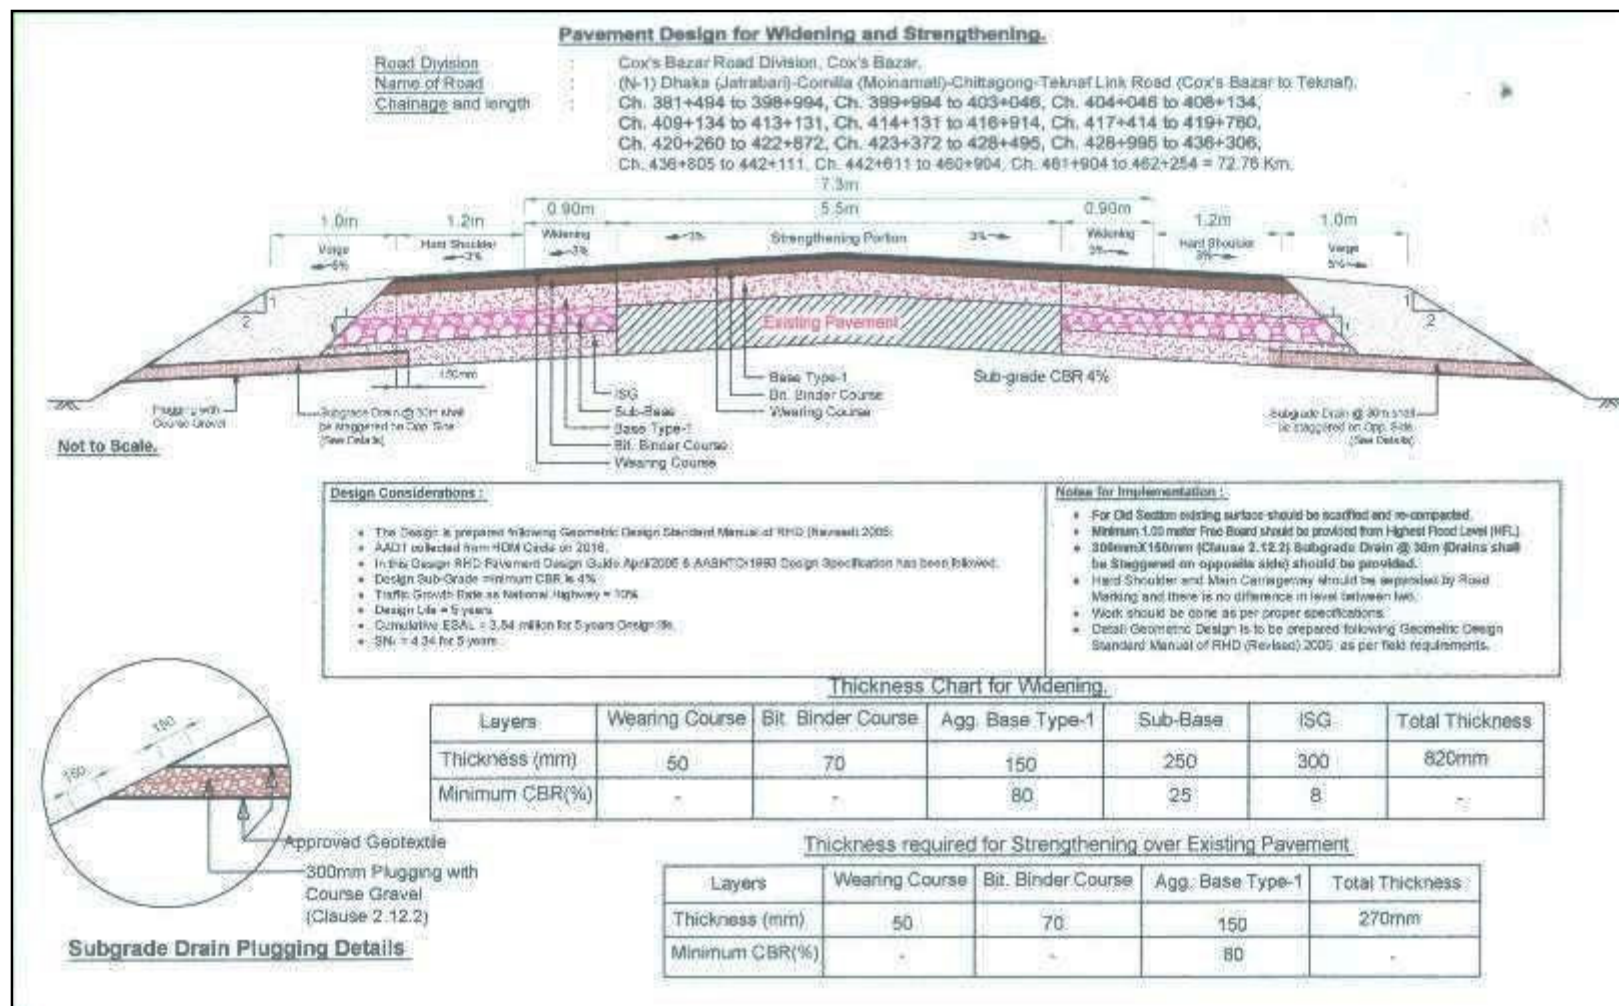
Typical Cross Section of the Proposed Road Alignment
